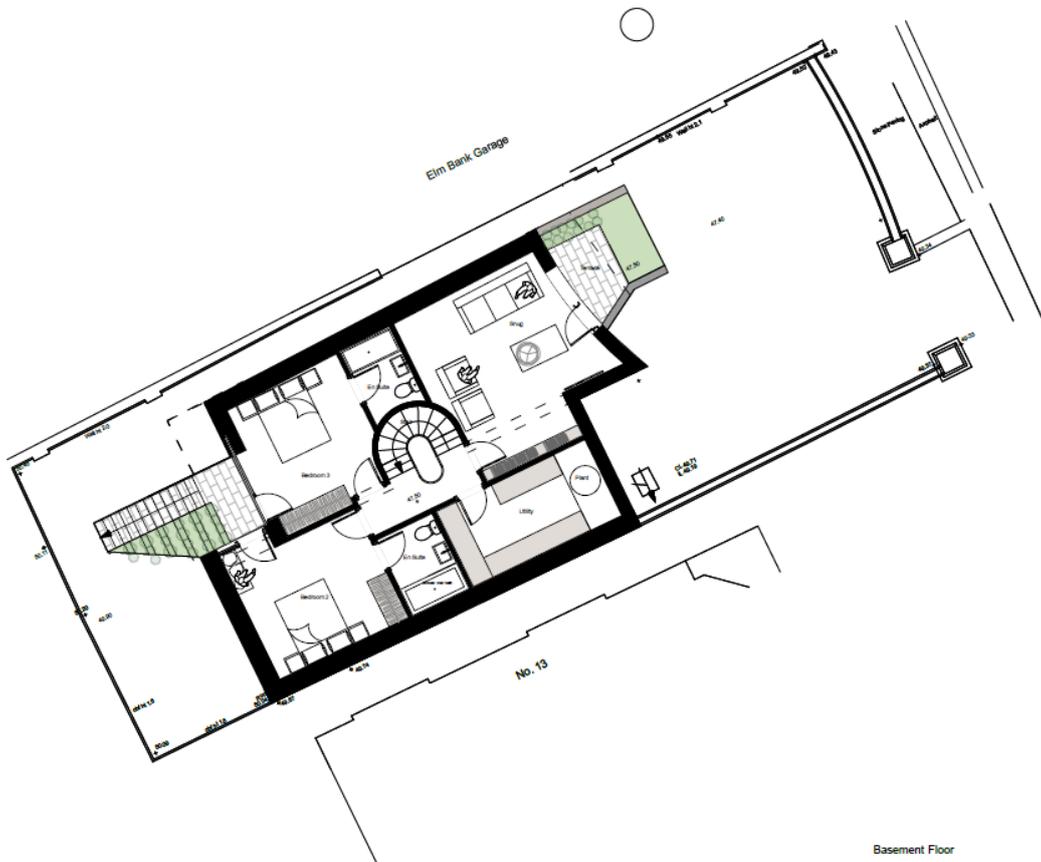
Proposed basement plans from Beech Architects Drawing Number 11-643i
